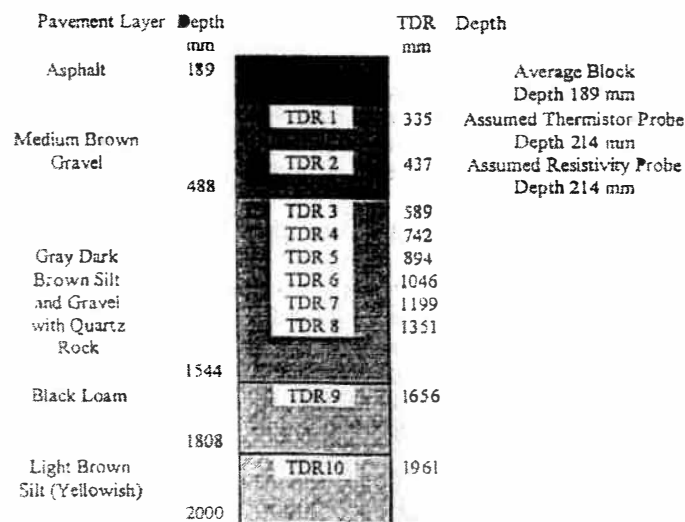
Profile of pavement structure and SMP probe depths for test section 091803.
